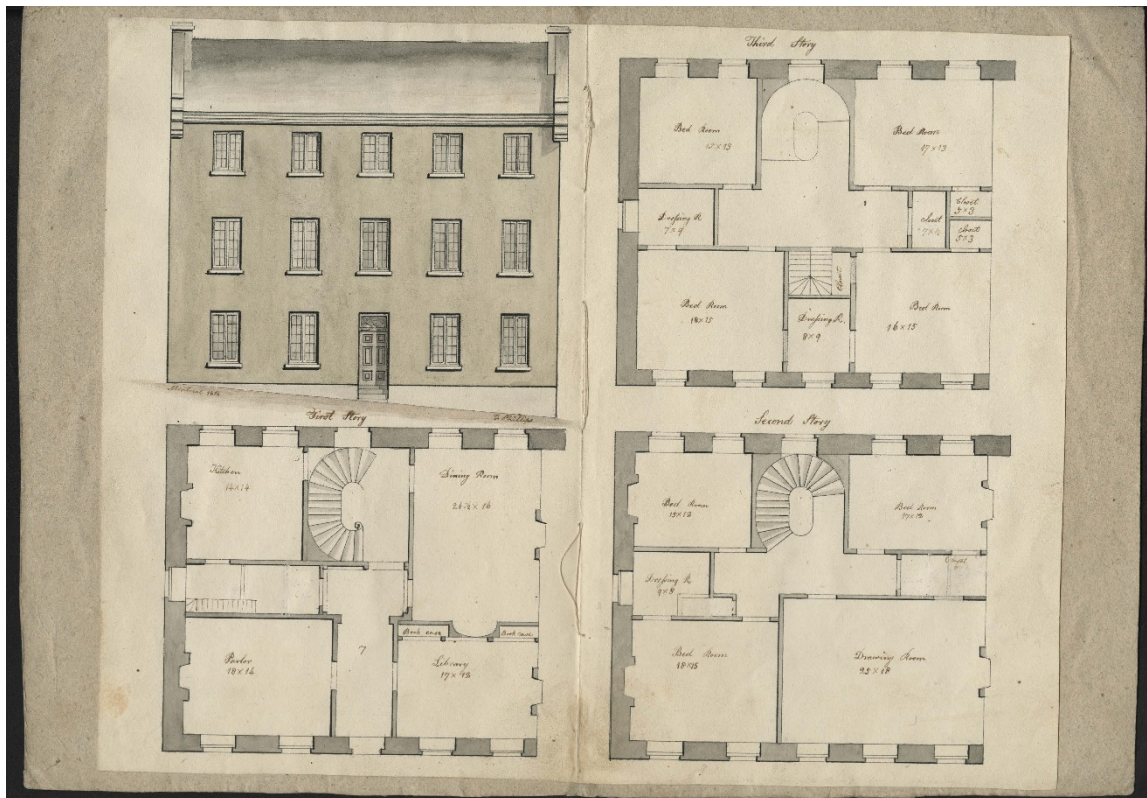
James McGill, Plan and elevation of house, 1816, Architectural Drawing from McGill Estate, McGill University Rare Books and Special Collections, Montreal, Canada.
